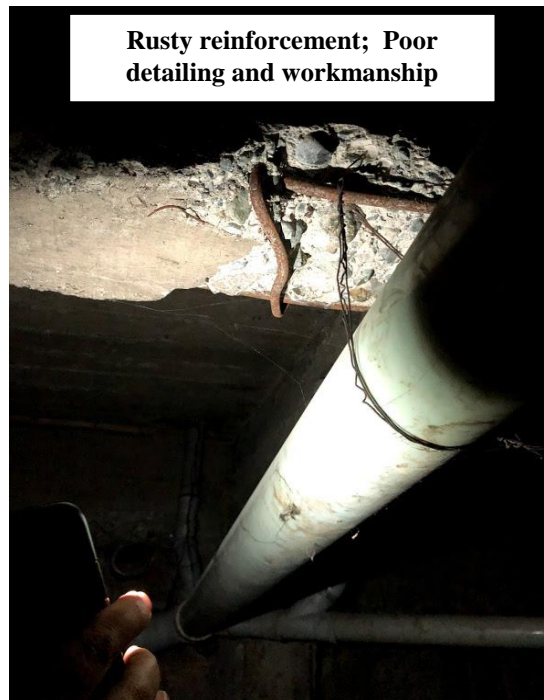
View of the basement of a residential building, rusty reinforcement bars, poor detailing and construction
